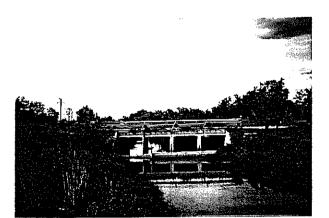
Concrete crump measuring weir on LN1 drain, EIA
